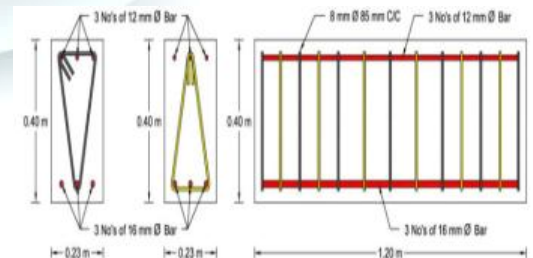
Triangular shear reinforcement details with gradually increasing spacing towards the center of the span
